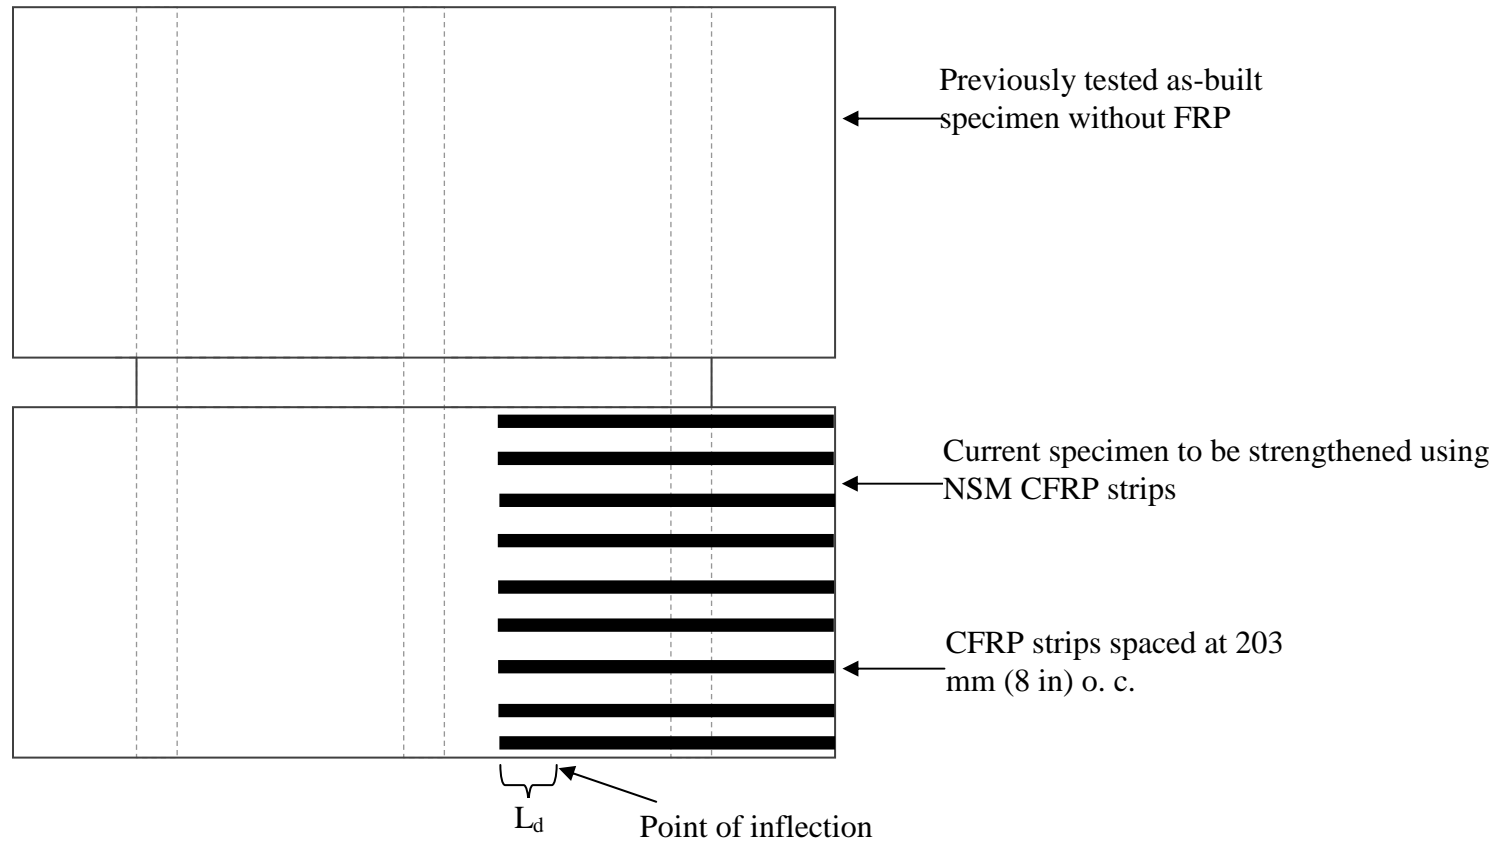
Plan view of deck illustrating chosen CFRP strengthening scheme
